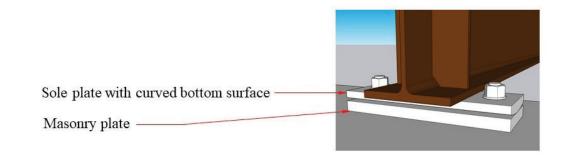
Simple Steel Bearing (Fixed Bearing Shown)
